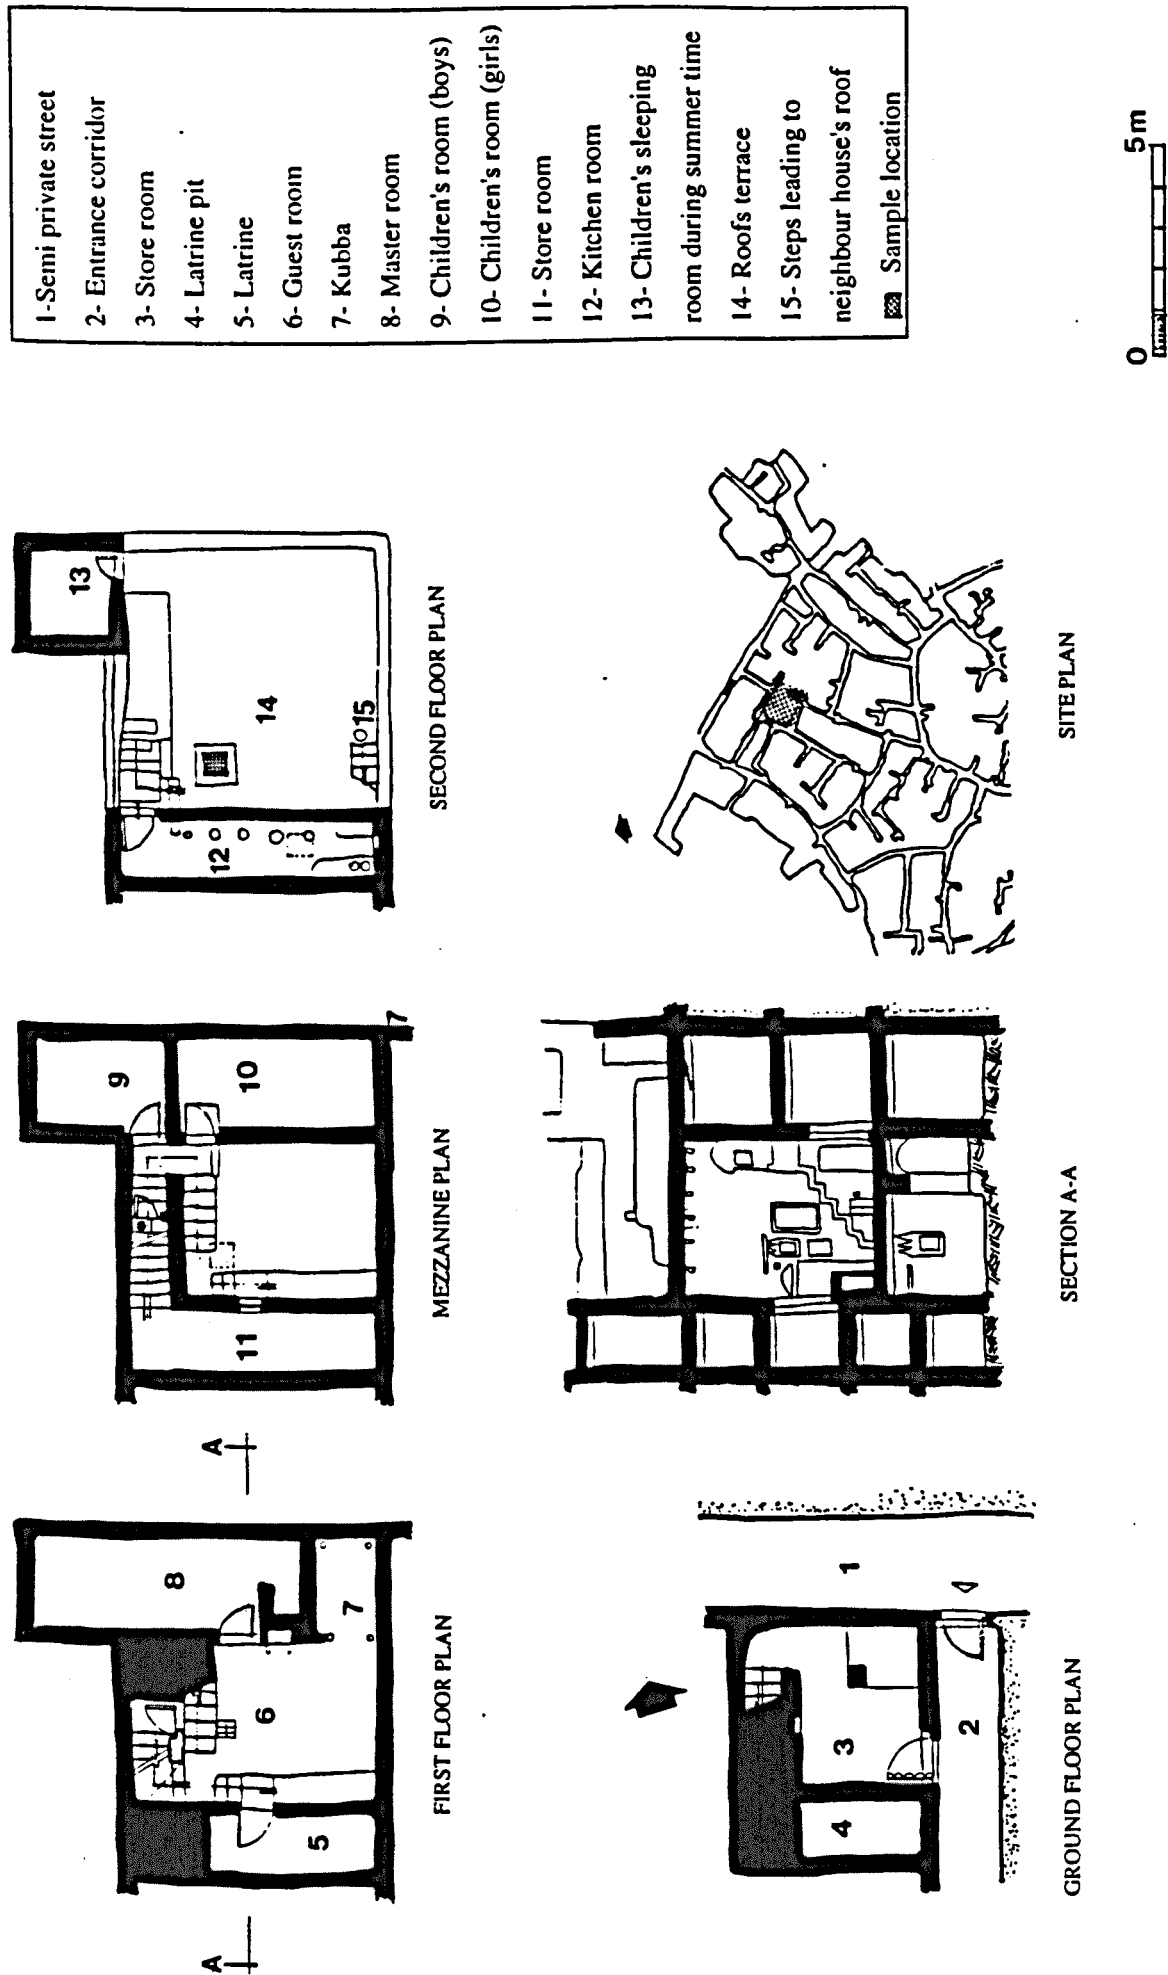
Ghadamesian house plan (Omar House) traditional settlement of Ghadames
